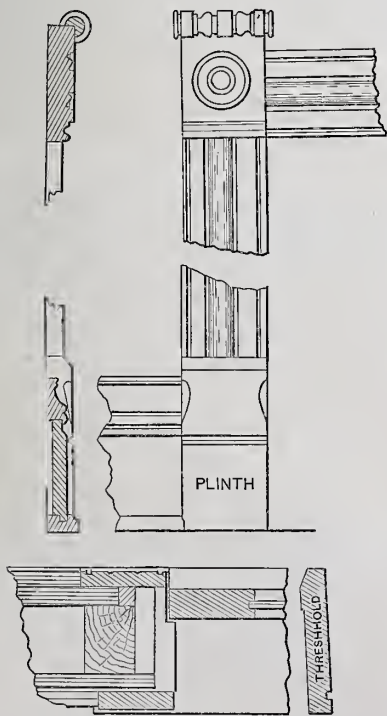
Detail Inside Trimming, Showing Vertical Section of Baseboard and Horizontal Section Through Door, with Section of Threshold.—Scale, 1 Inch to the Foot.
